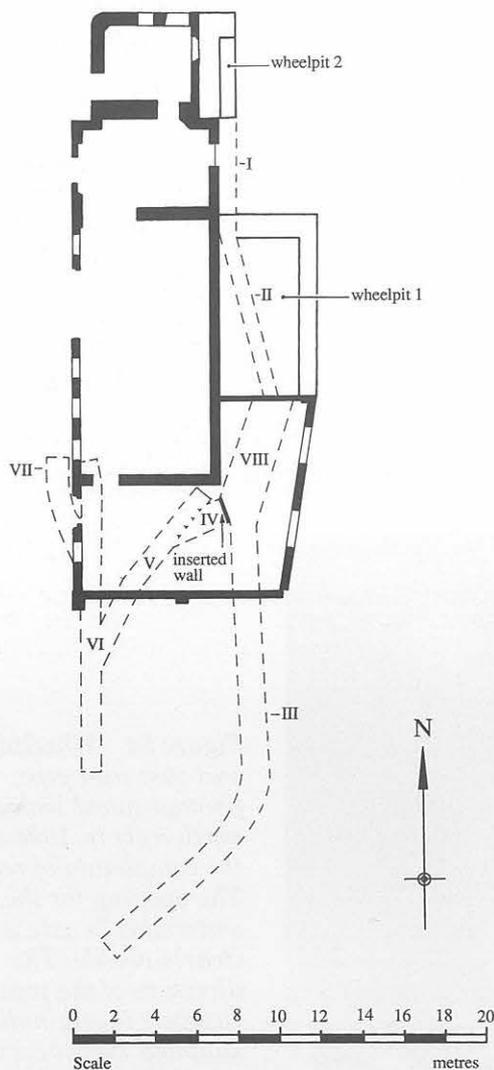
Plan of the culverts beneath the Upper Forge in relation to the extant wheelpits.
